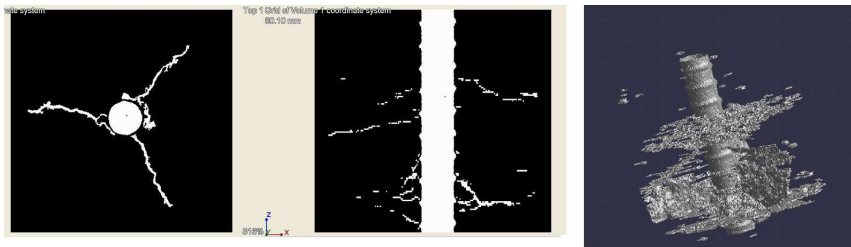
Internal Cracking at Load Level 8400 lbs
